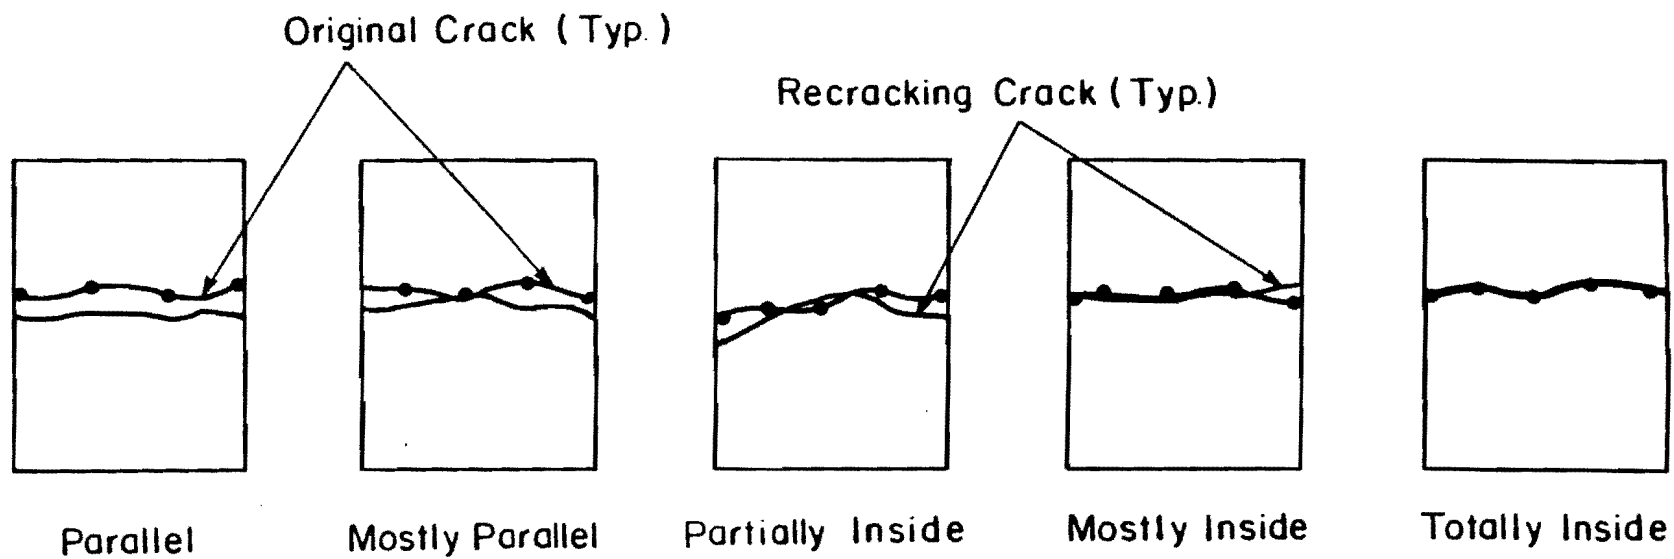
Location of Recracking Crack Relative to Initial Crack
